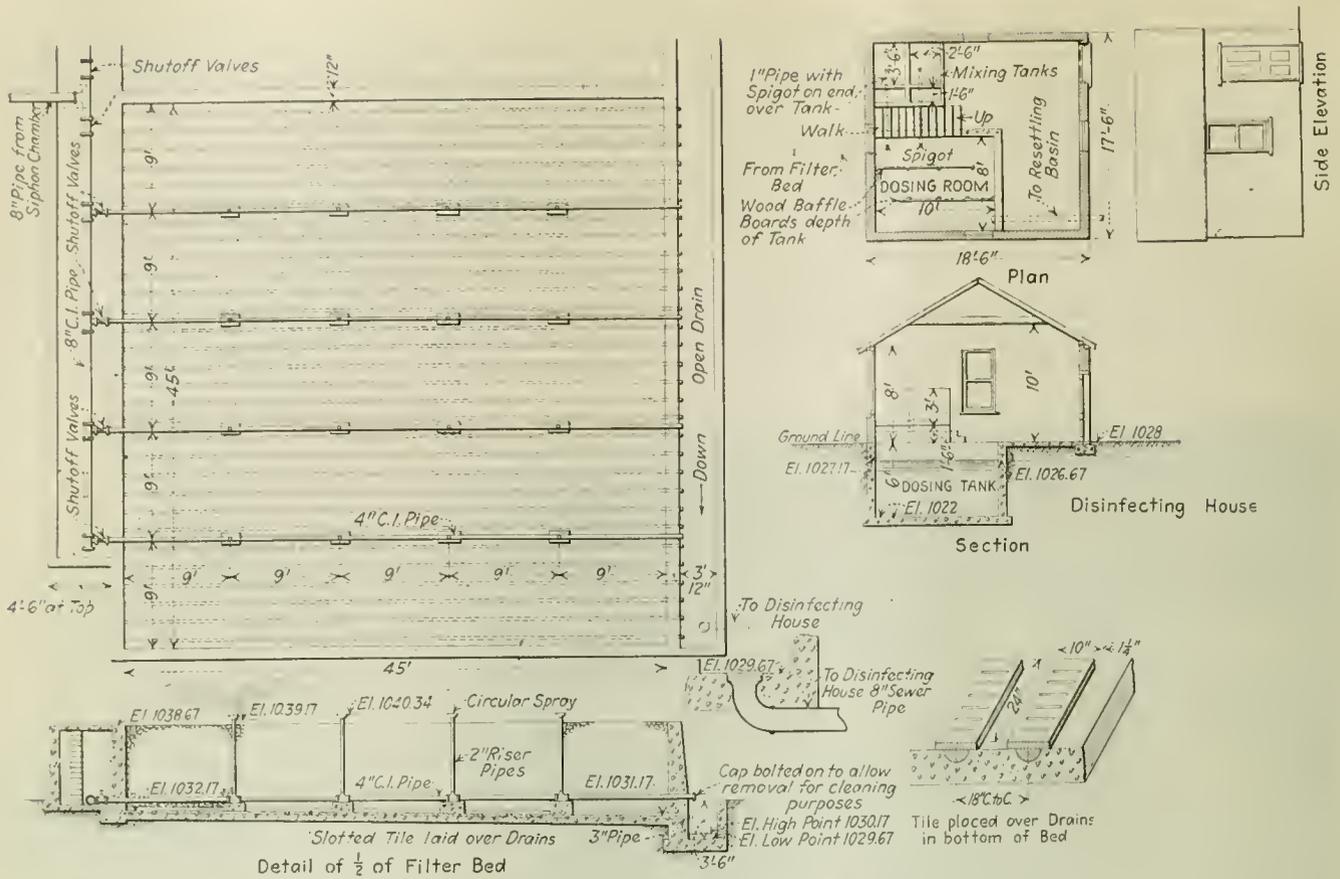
DETAILS OF FILTER BED AND DISINFECTING HOUSE
